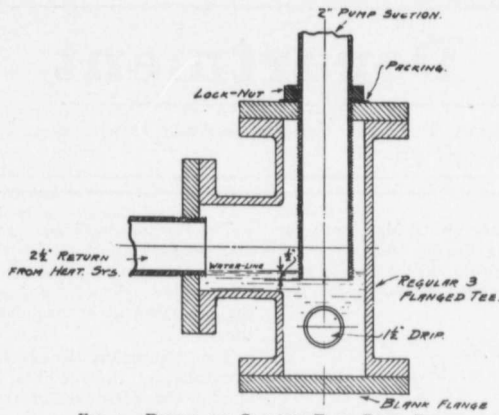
DETAIL OF SECTION T IN PUMP PIT.
